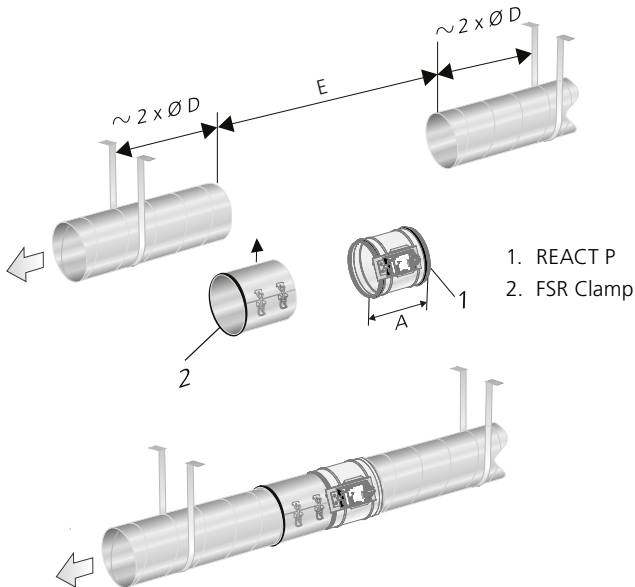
Installation in the duct system. The ducts must be firmly fixed to the frame of the building on each side of REACT P.
